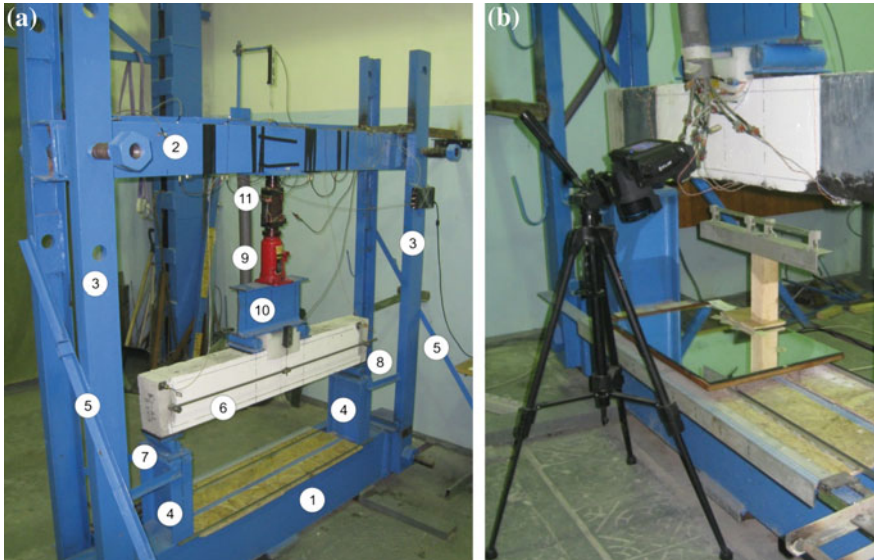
a Test bench: 1 the bottom beam of the test bench, 2 the top beam of the test bench, 3 twin rack, 4 rack, 5 mowing, 6 a sample beam, 7 hinged movable support, 8 hinged immovable support, 9 hydraulic jack, 10 distribution bar, 11 loadmeter; b the scheme of the infrared photography: 12 the thermal imager FLIR T620, 13 halogen lamp, 14 mirror
